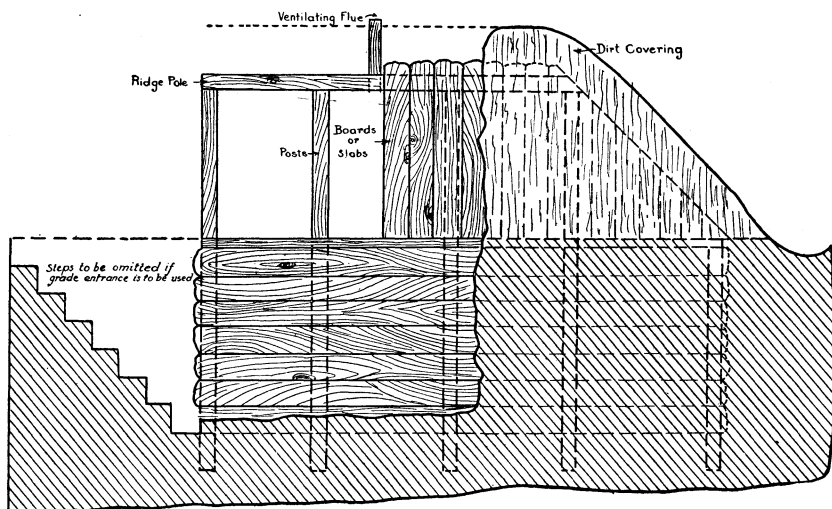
End view of an outdoor storage cellar showing the frame of posts covered with planks or puncheons and with soil. Additional protection may be given by placing manure, straw, or corn fodder on top of the dirt.
